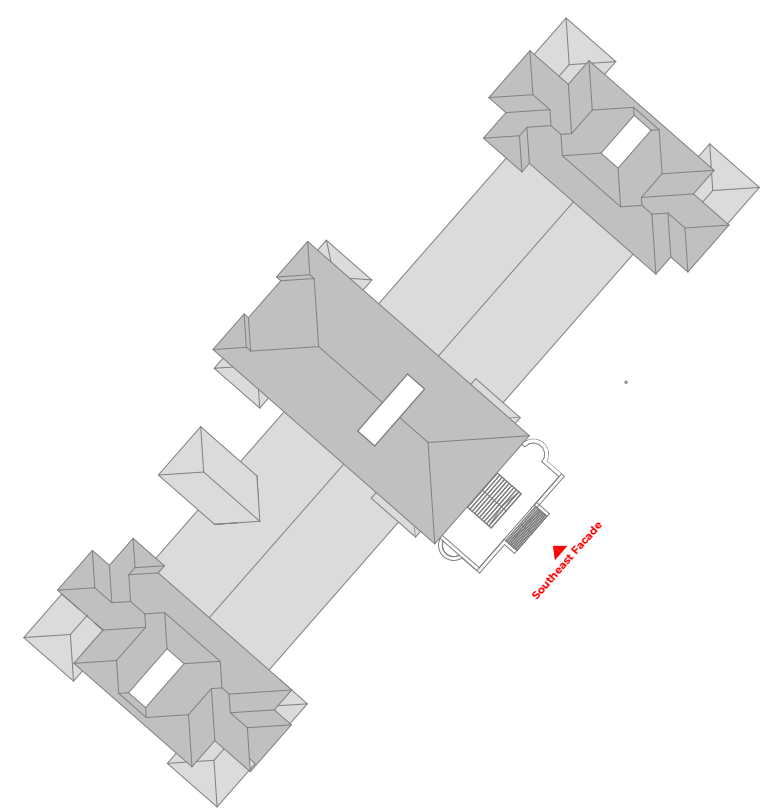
Roof Plan (Source: Created by the author, 2024)
